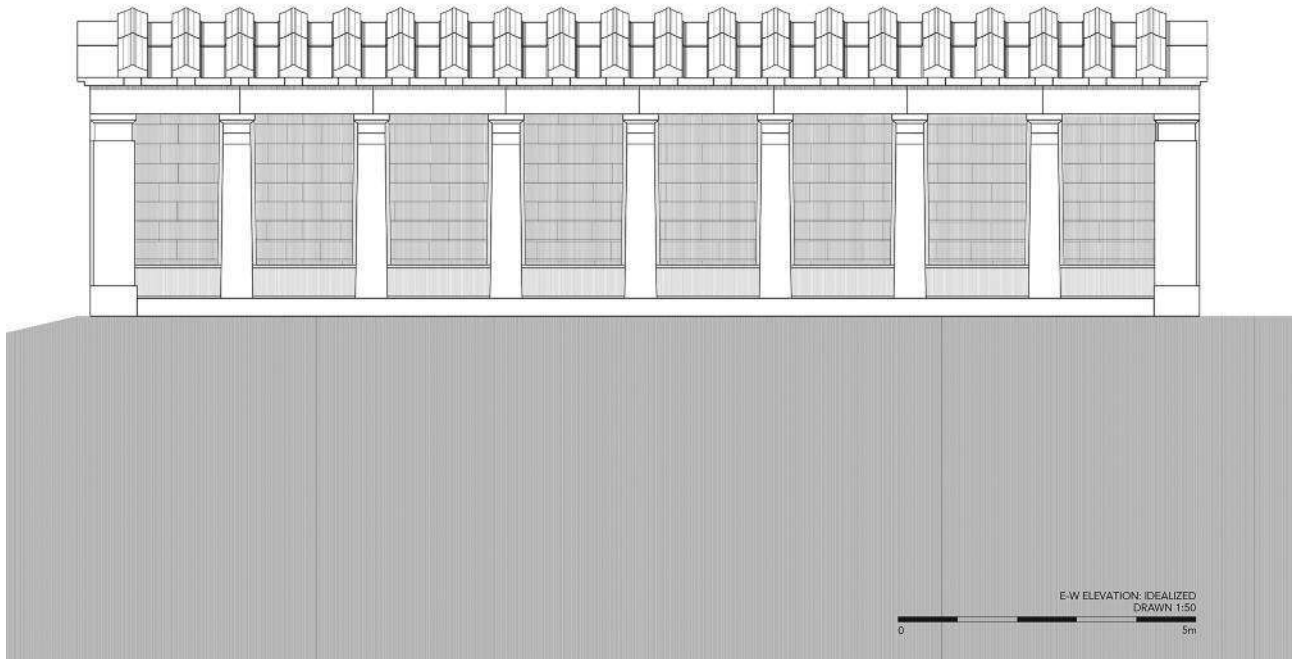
Schematic and idealized elevation of HF, looking S (BULP).
